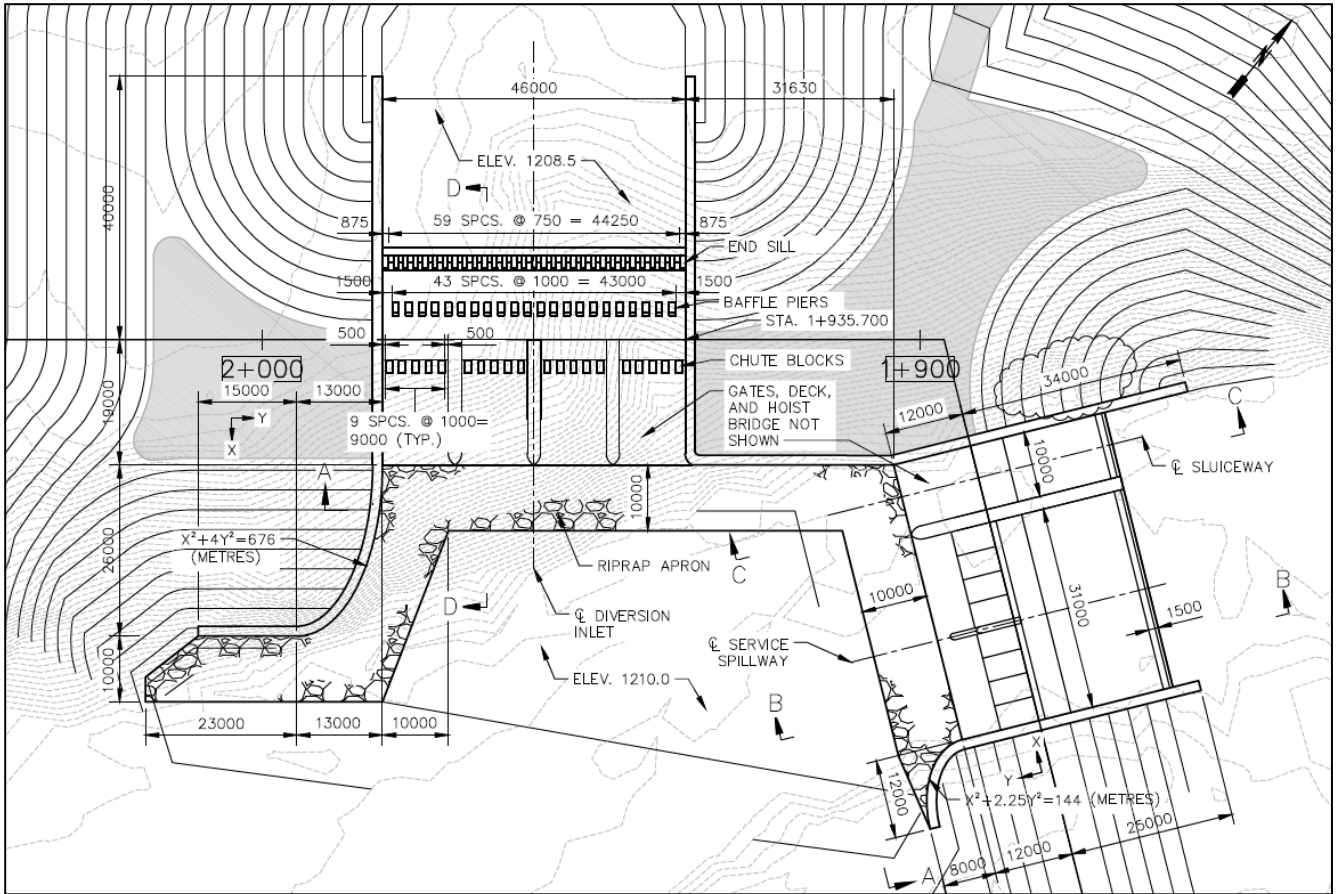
Plan view of the initial diversion inlet structure and service spillway.
